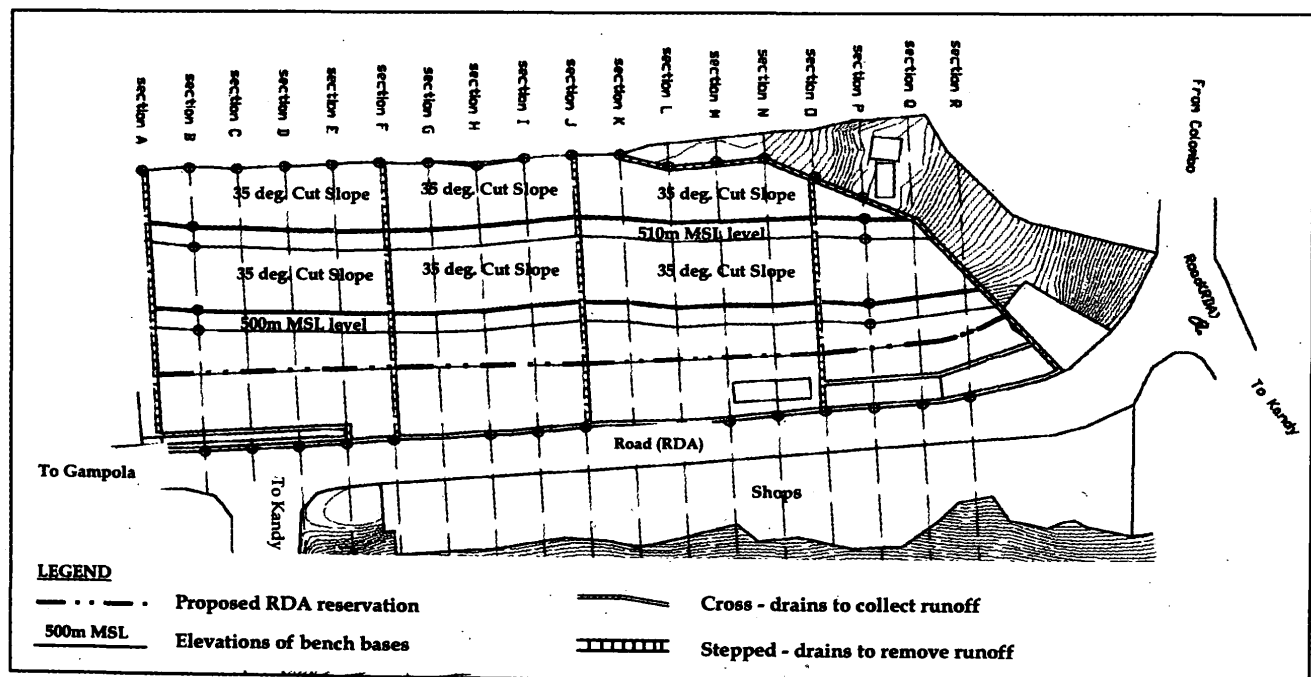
Proposed re-arrangement of slope at Peradeniya town
